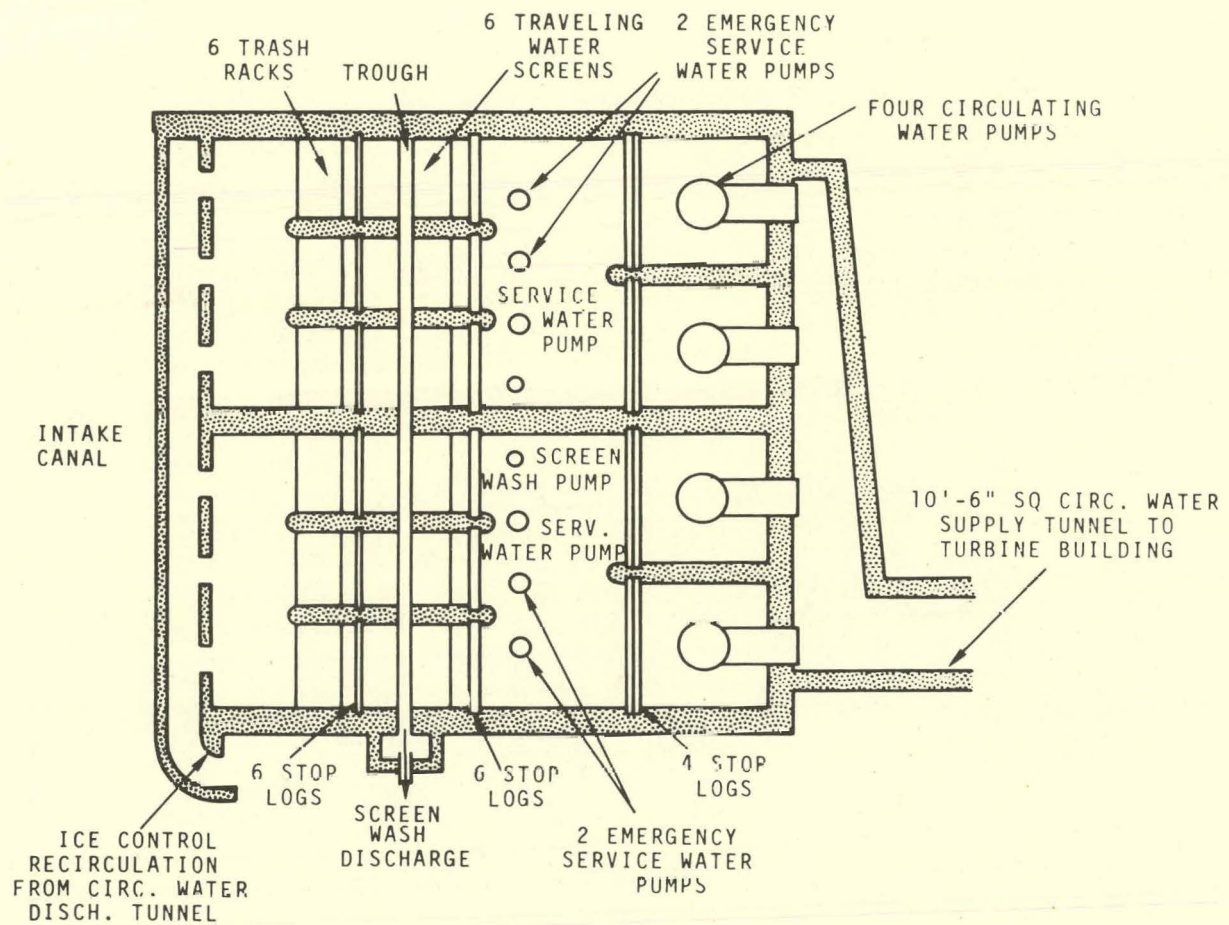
Plan of Intake Structure at Centerline of Recirculation Tunnel.
